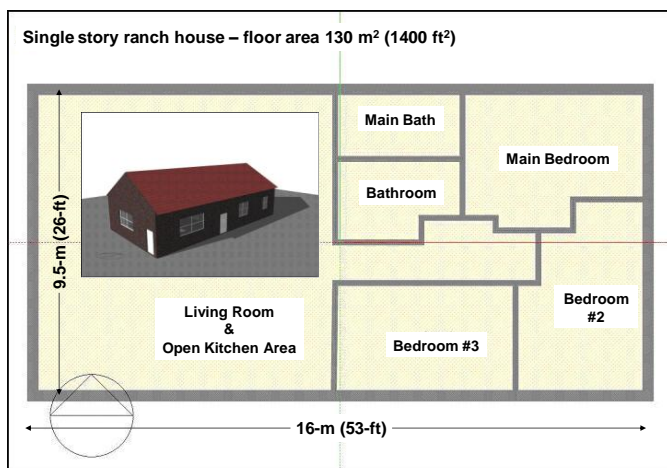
Floor plan of the one-story ranch house used in whole house energy simulations.
